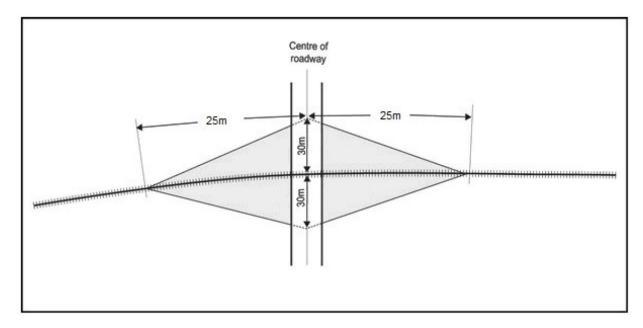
Approach sight triangles for public road/rail siding level crossings.
